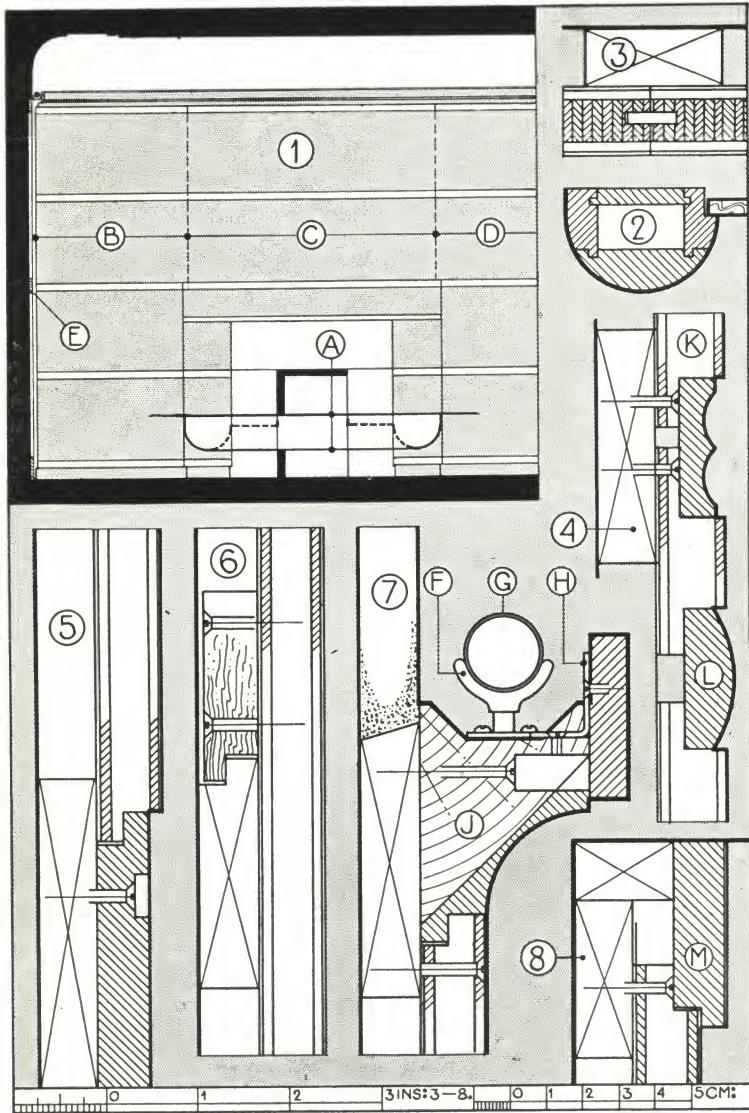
, B,C,D,: Paneling components on the fireplace side of a room. Vertical battens fixed in wall angles and behind jointed sections. Horizontal battens indicated in larger diagrams.
